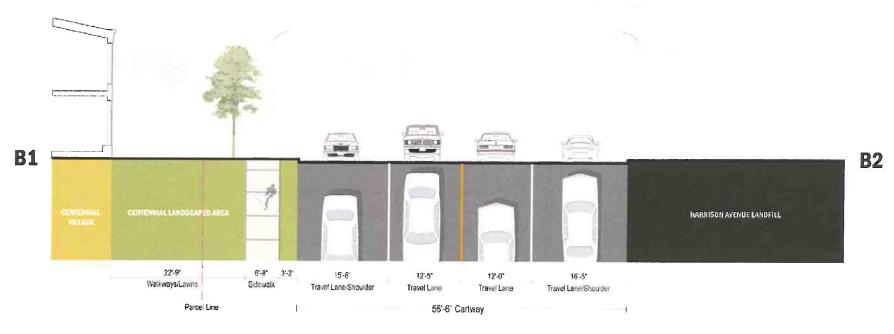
Existing State Street between Harrison Avenue and Centennial Drive outlet
